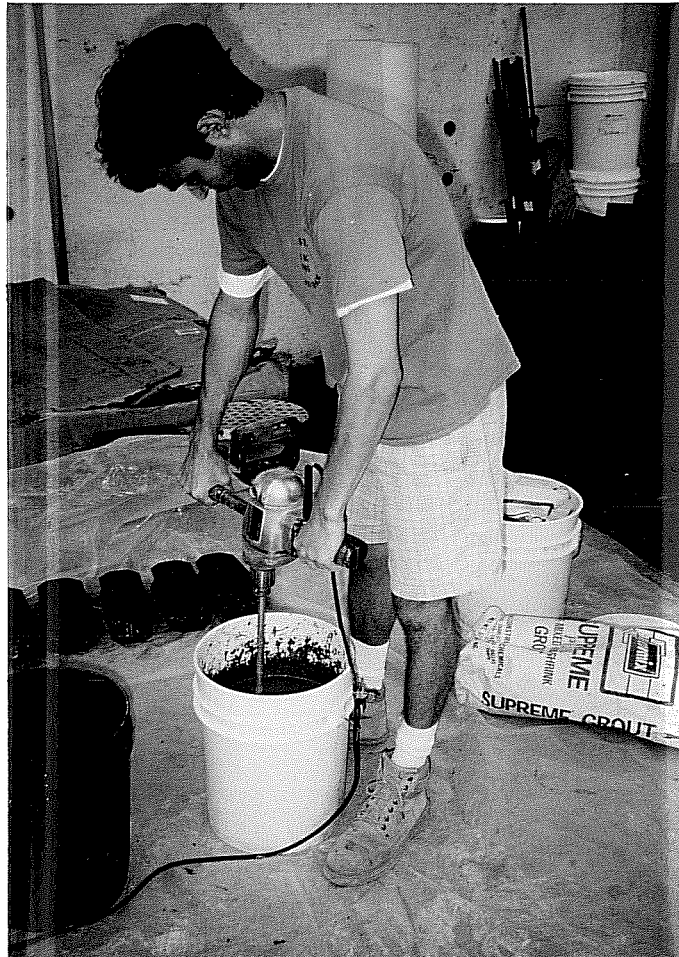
Paddle Mixing of Non-Shrink Grout
